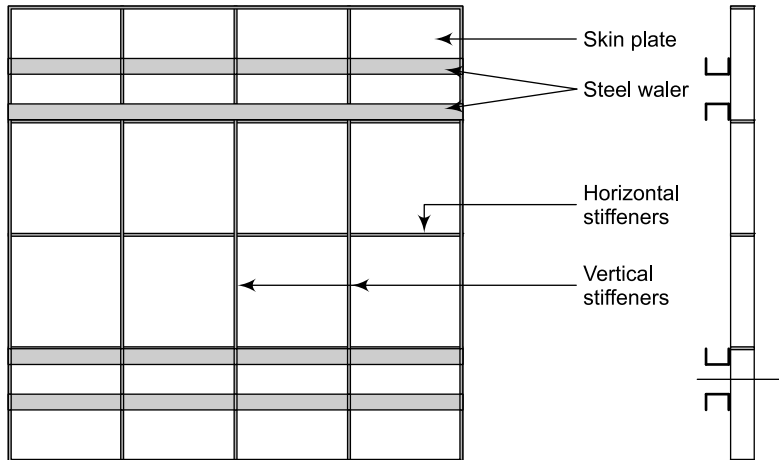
Front and Side Elevation of Proposed Wall Formwork Showing Waler and Tie Locations.
